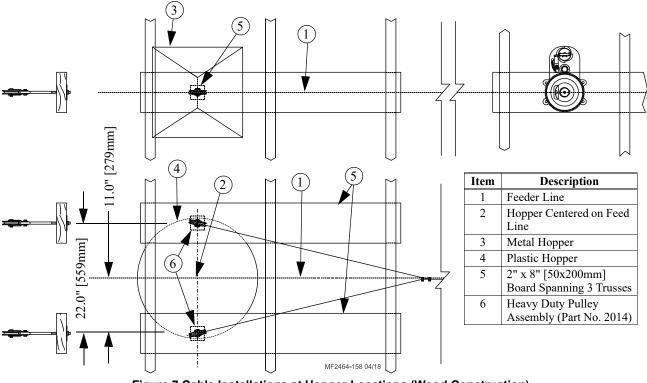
Cable Installations at Hopper Locations (Wood Construction)
